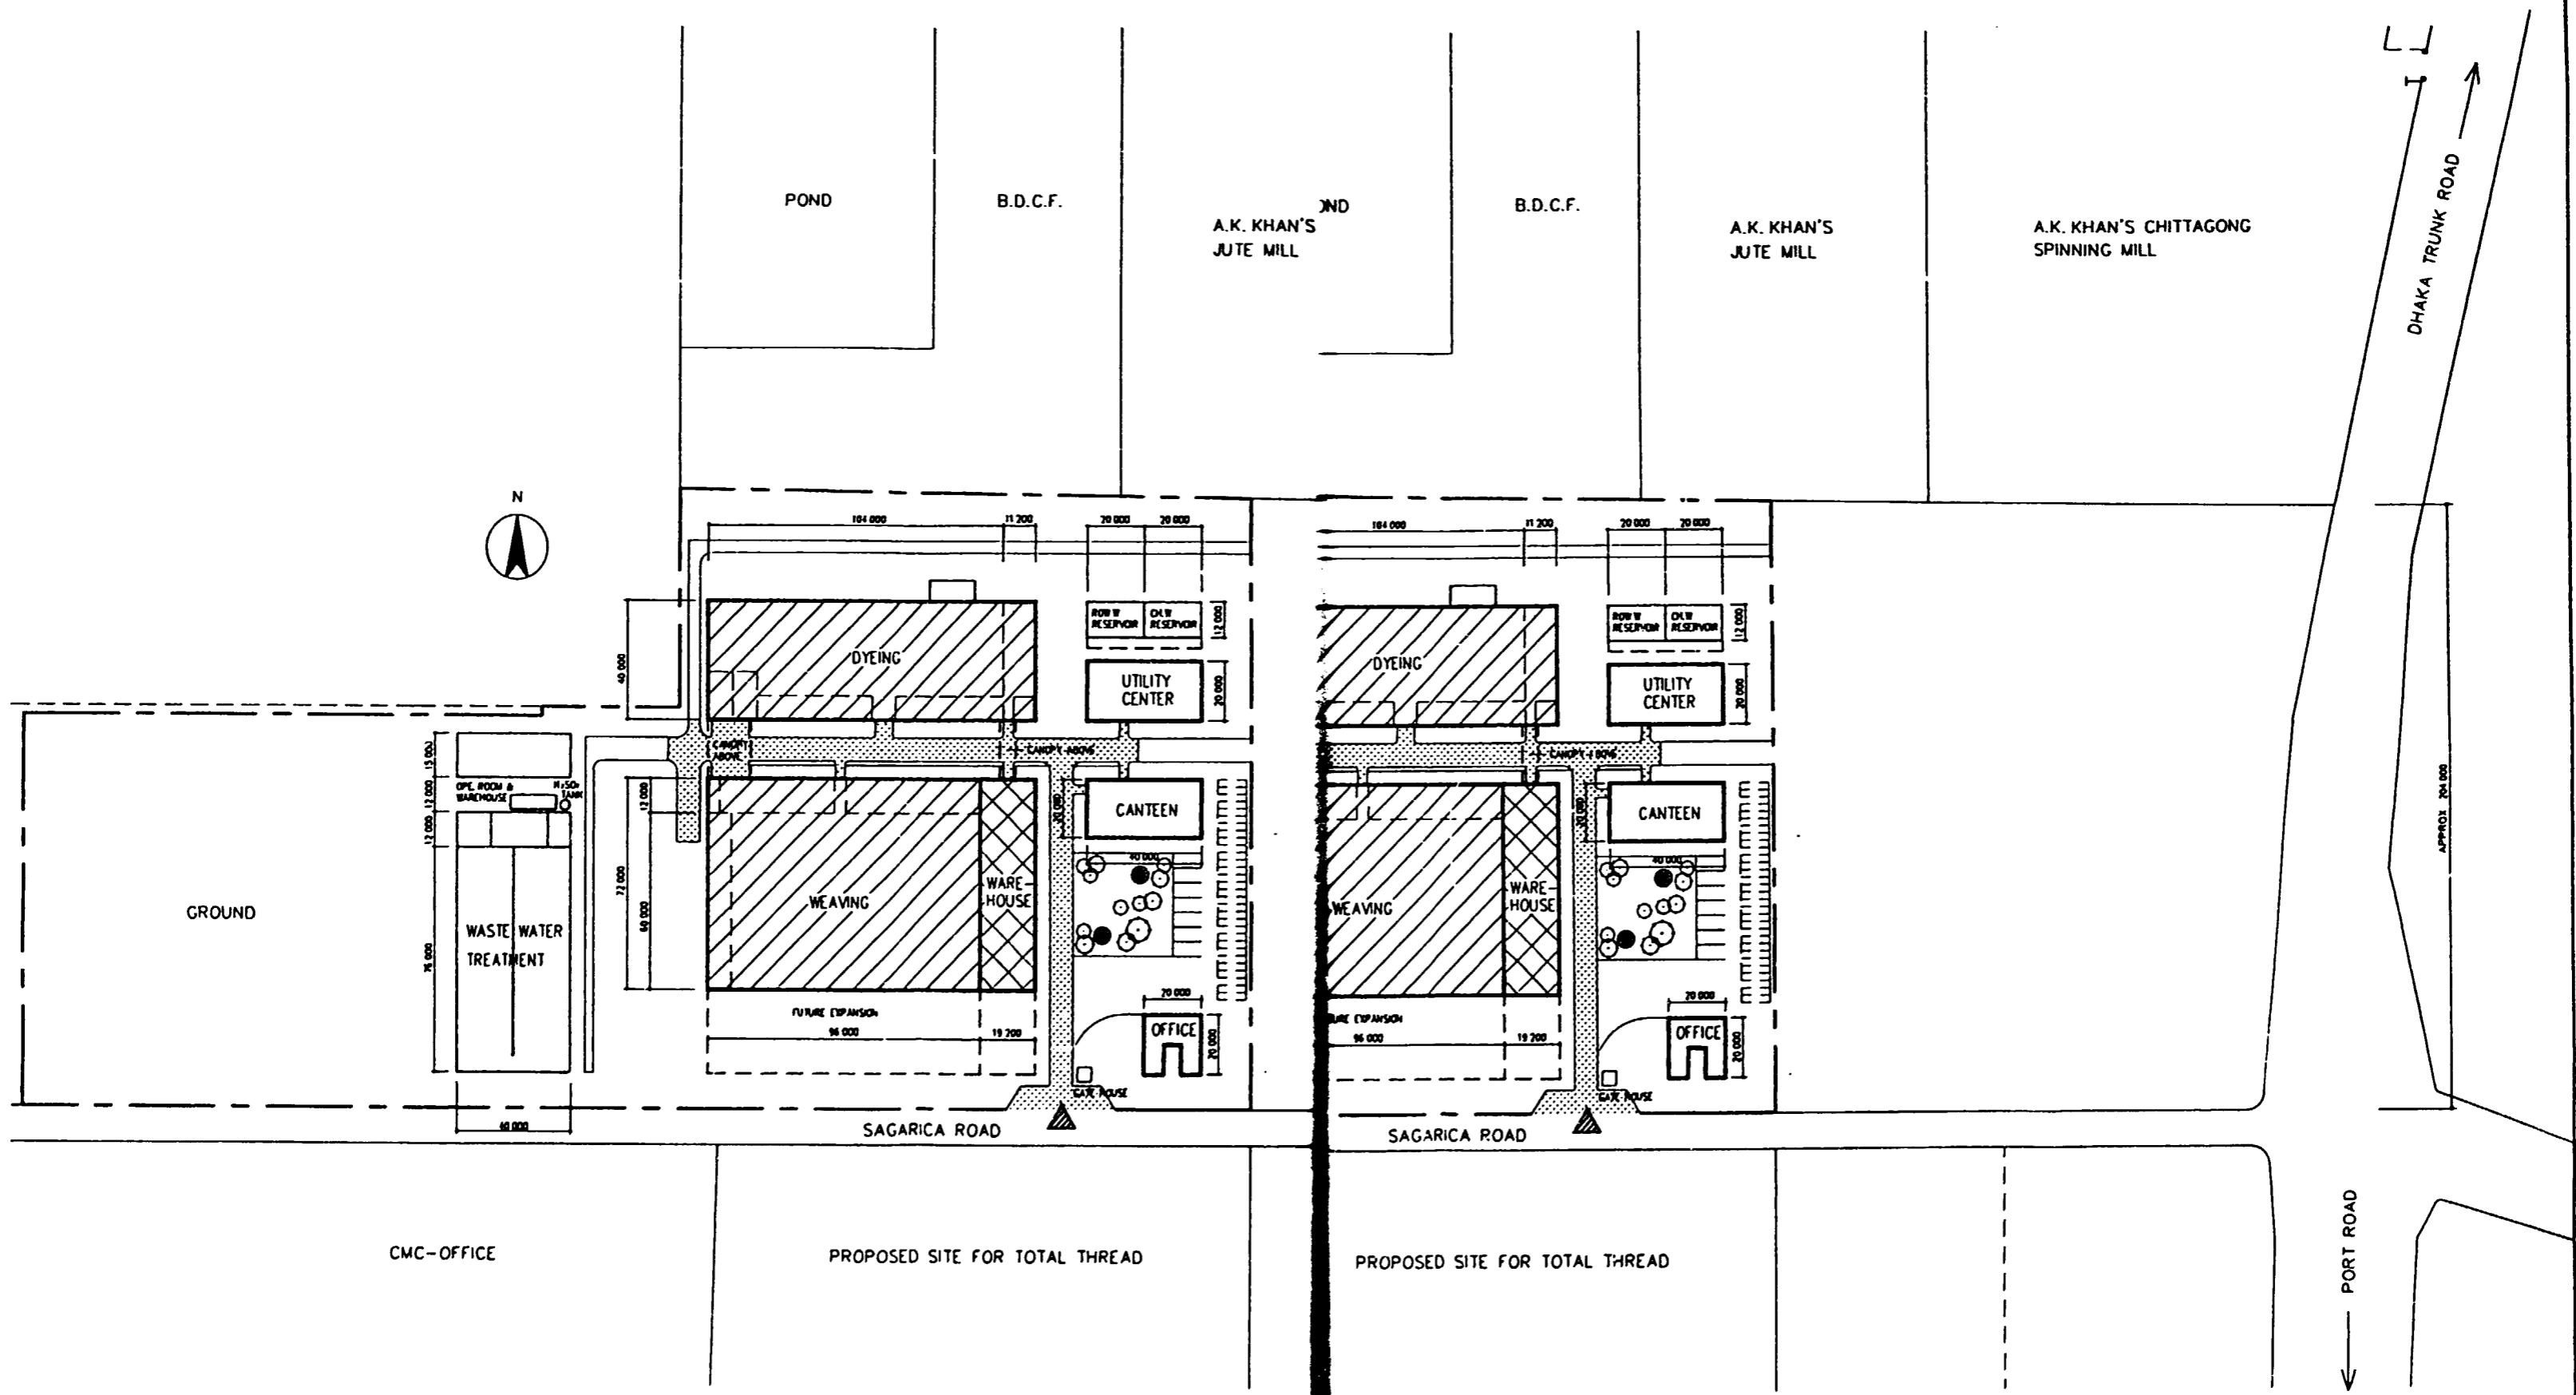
BLOCK PLAN OF PROPOSED MILL 9 : BLOCK PLAN OF PROPOSED MILL (Case 4)
